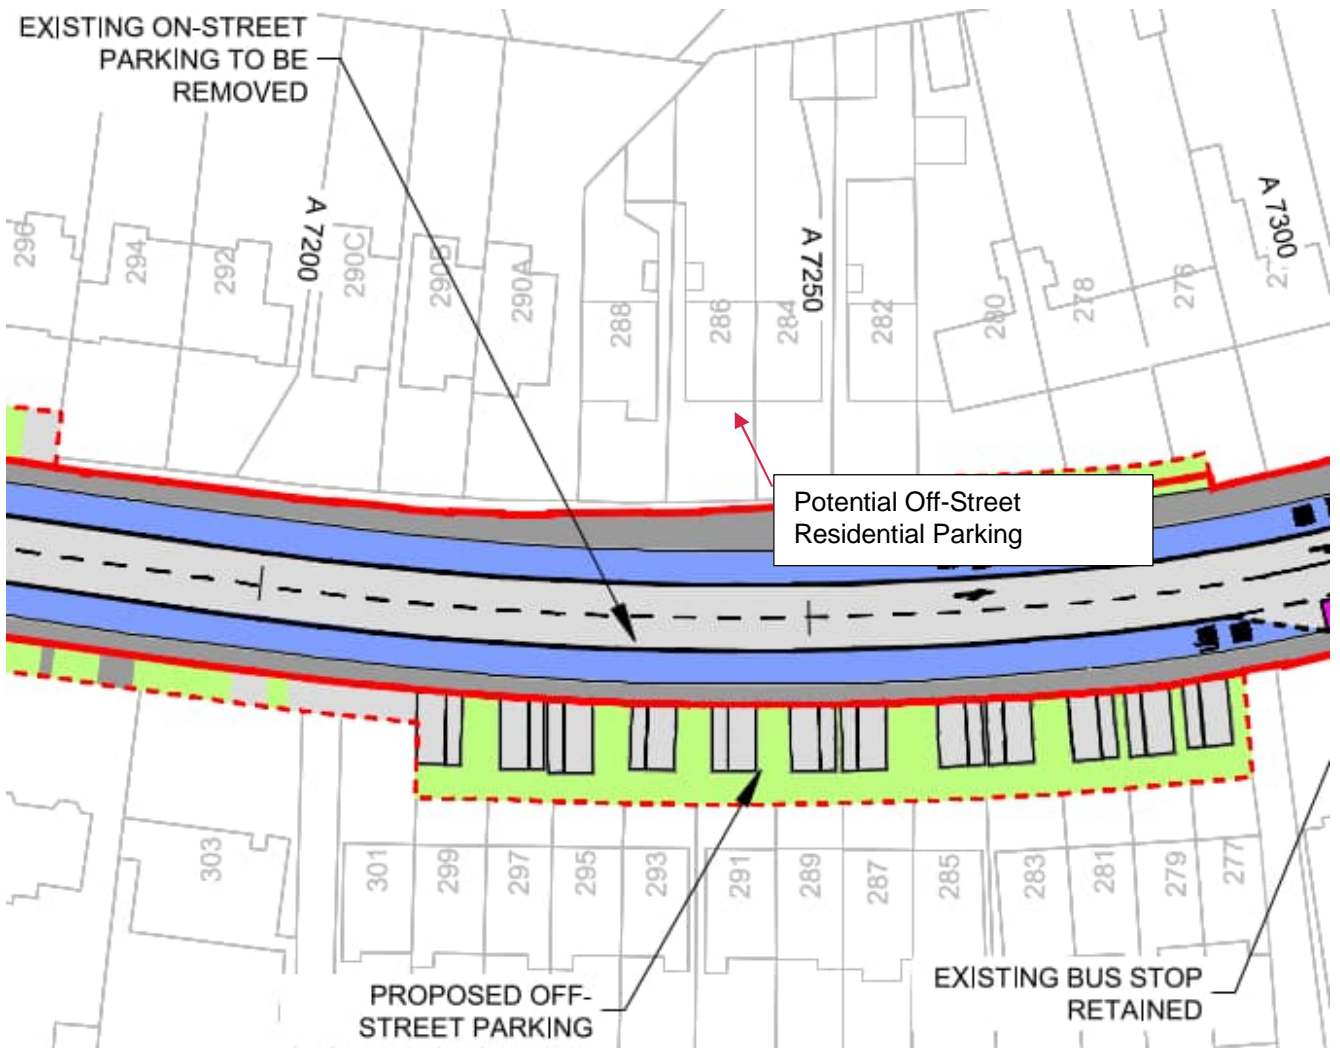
Potential off-street residential parking facilities at Shanowen road.
